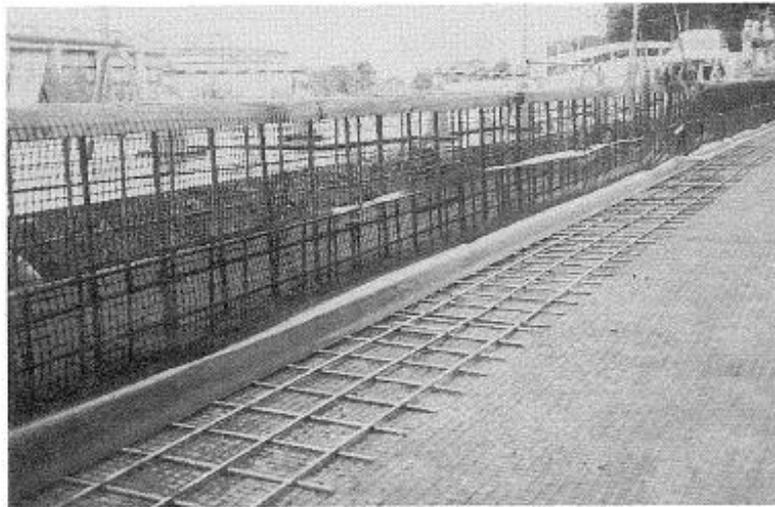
Layout of welded steel fabric
